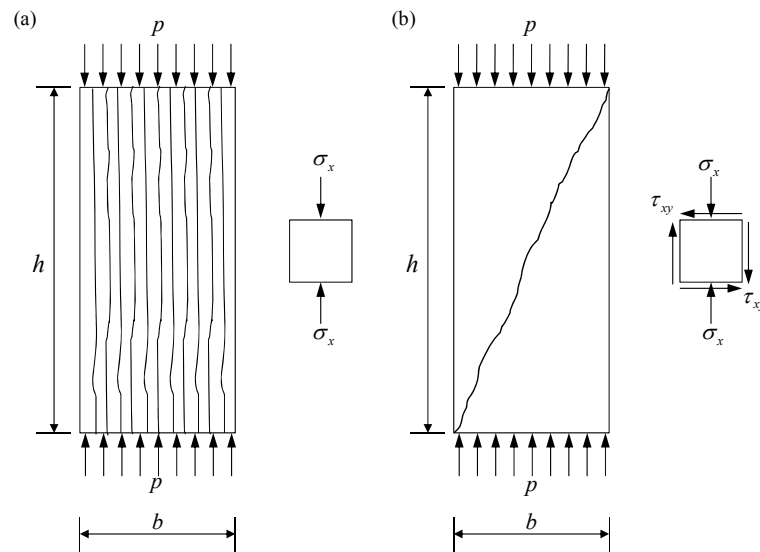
Two different failure mechanism of concrete strut: (a) General compressive failure mechanism; (b) Compressive sliding failure mechanism
